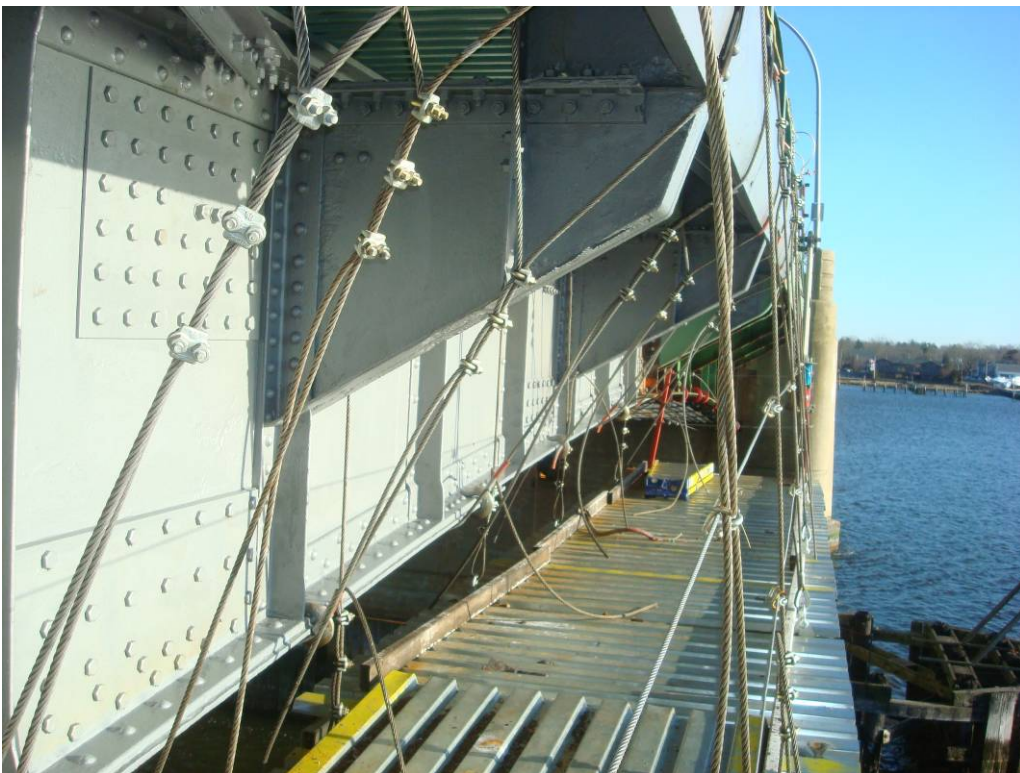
The painters primed the West fascia and touched up previously primed areas that were damaged due to the steel repairs.
